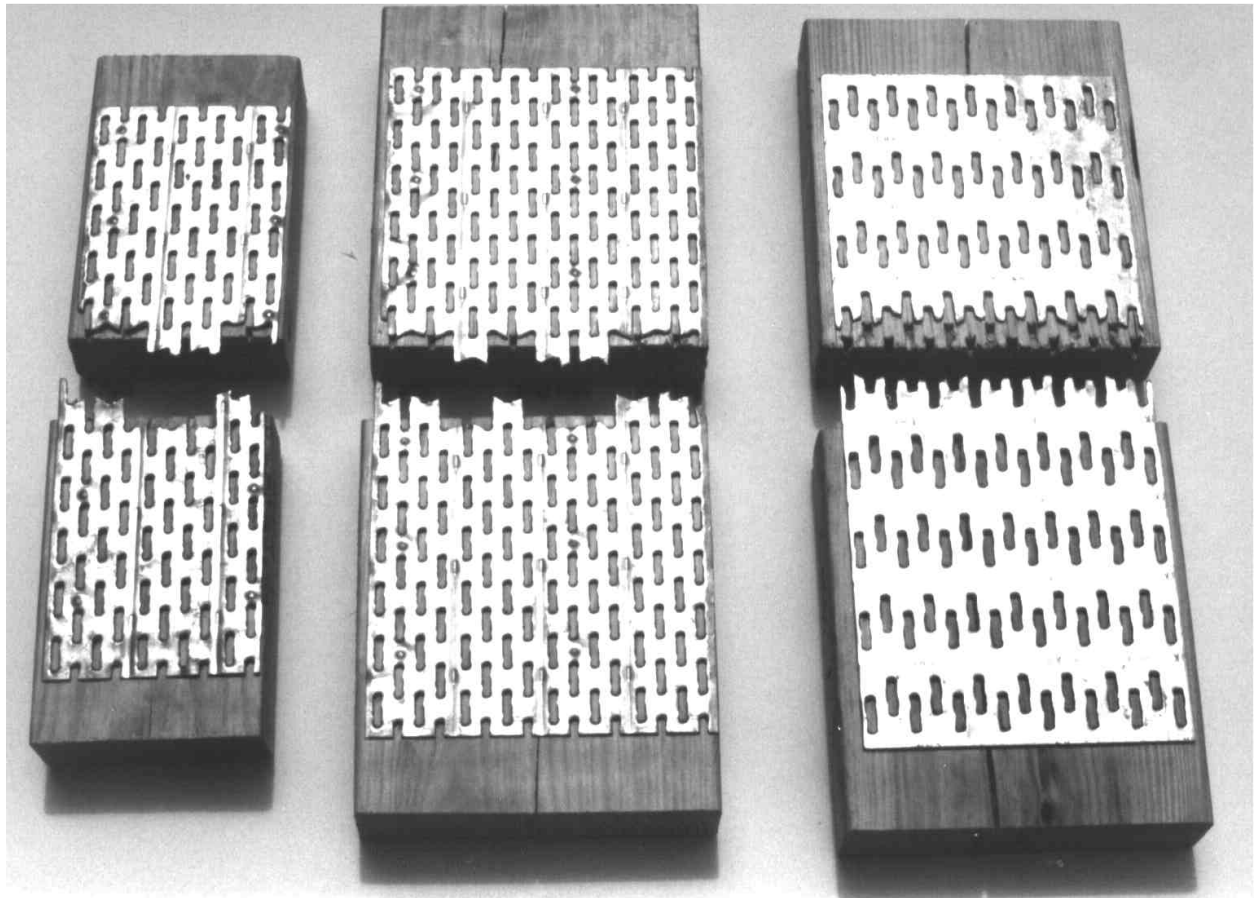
Typical failures for the three joint configurations tested in tension-only loading. Shown in the photograph, from left to right, are a 2x4 joint with 20-gauge plates, a 2x6 joint with 20-gauge plates, and a 2x6 joint with 16-gauge plates.
